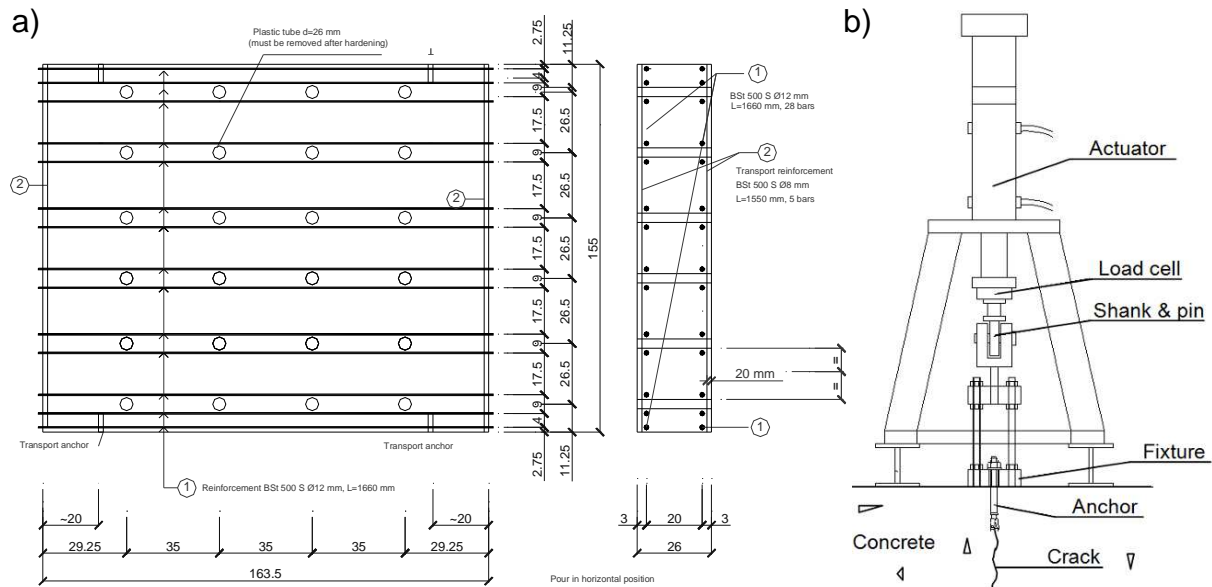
a) Drawing of wedge-split concrete slab; b) Schematic loading setup
